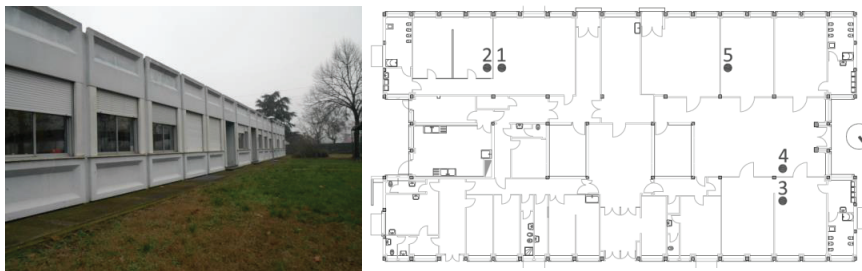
(left) Picture of the southwest façade; (right) kindergarten plan view including the five monitored rooms.
